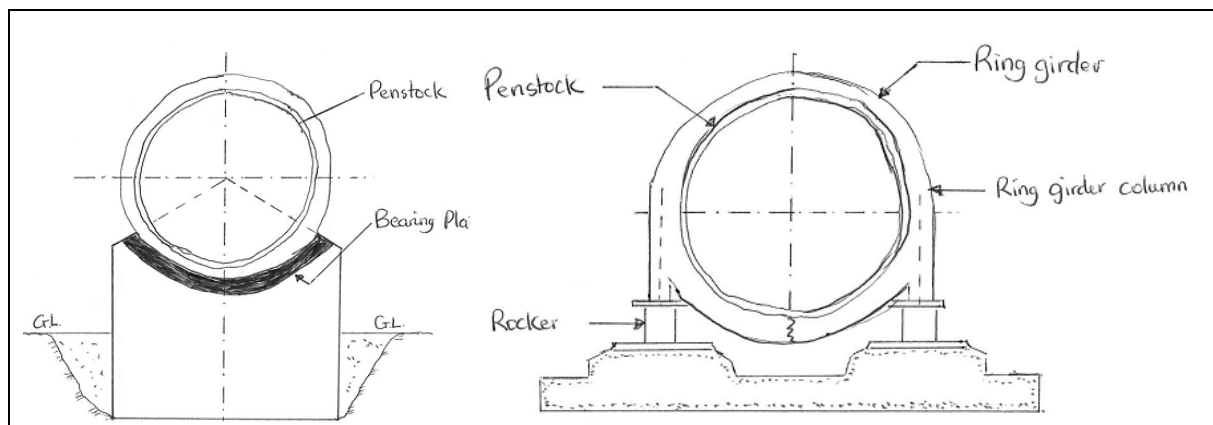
Penstock support types: Saddle (left) and ring girder support (right)
